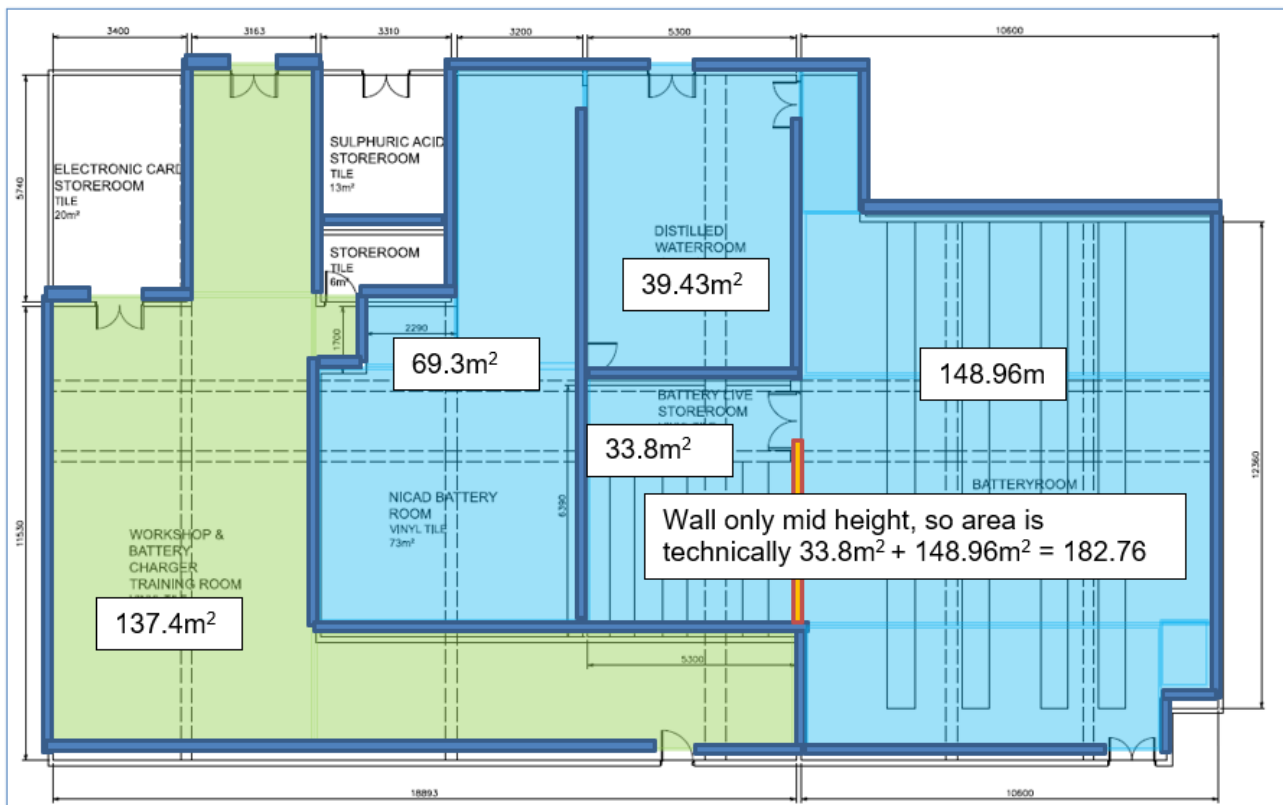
DC Workshop (Green) and Battery Room (Blue) – Area sizes
